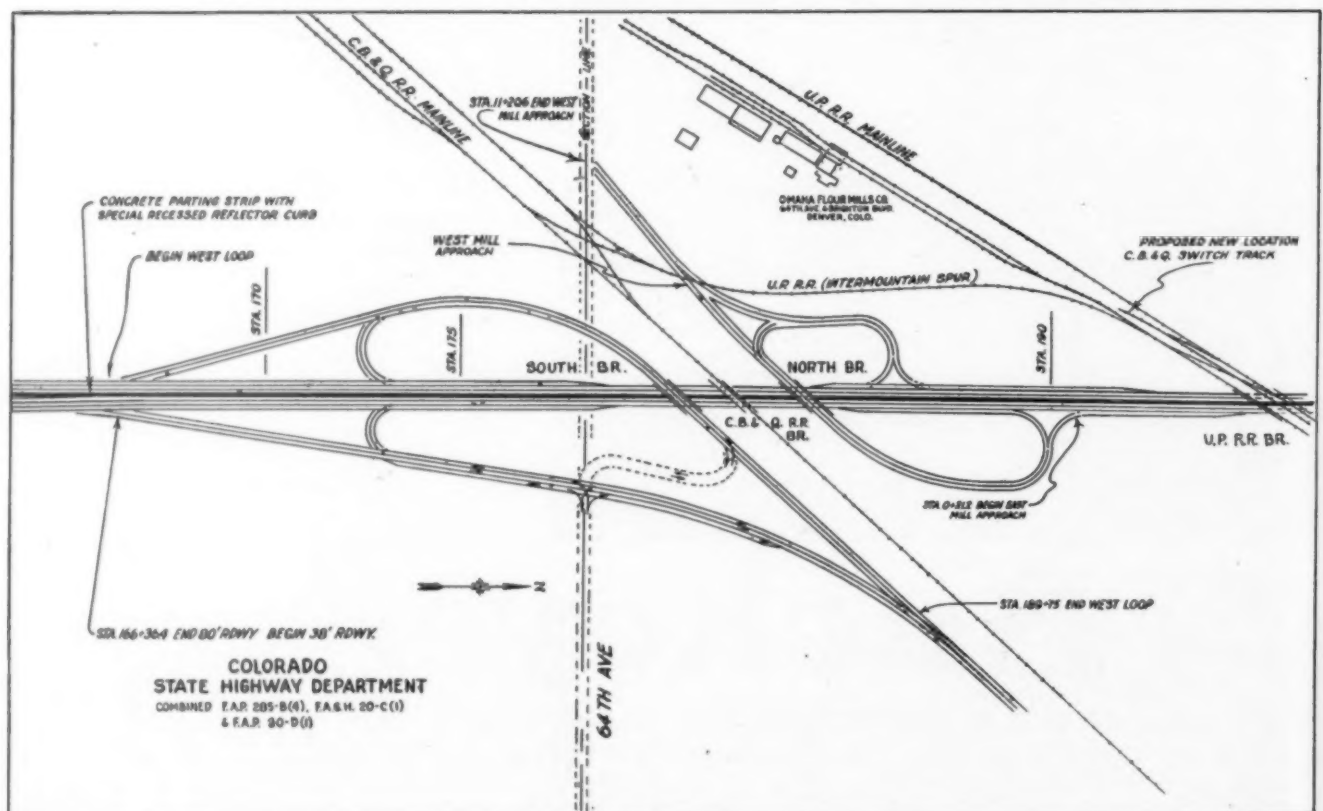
General plan of cloverleaf arrangement showing location of the main structures
